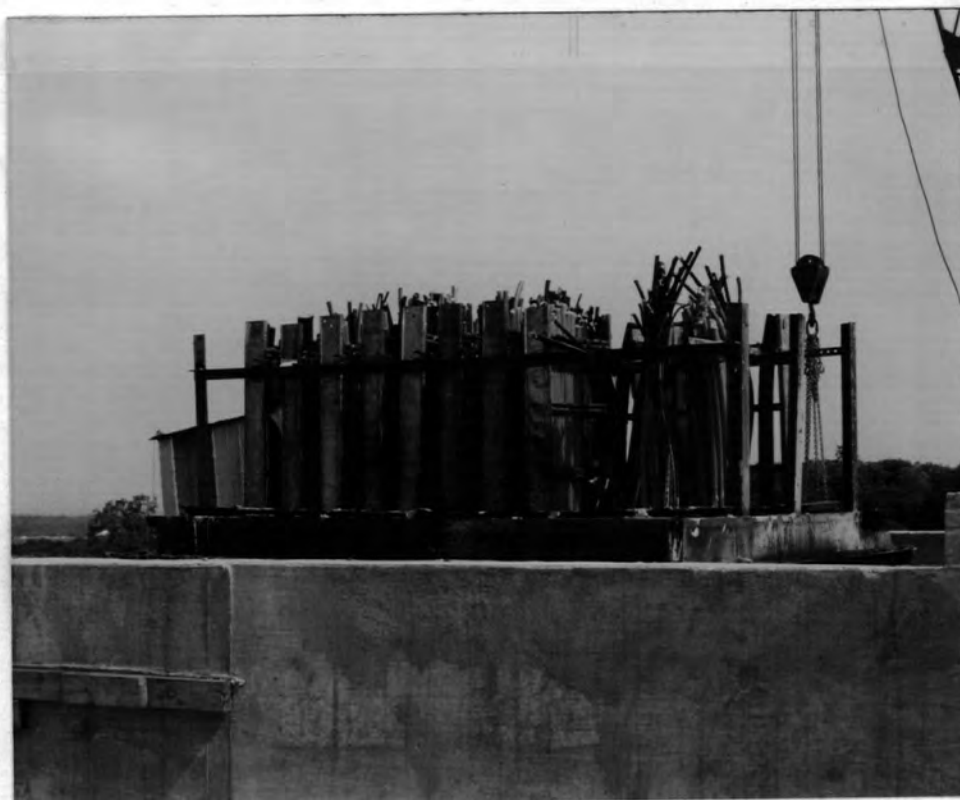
OVERALL VIEW OF TEST SLAB PLACED ONTO FURNACE
